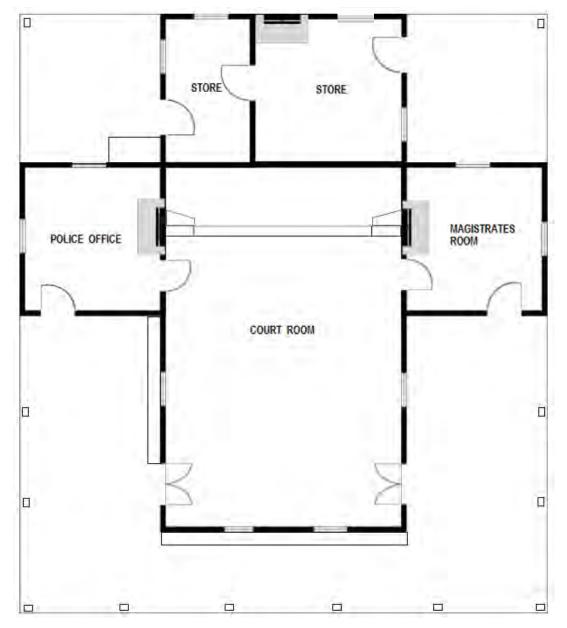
Interior plan of the Clarence Town Courthouse (Based on historic drawings of the Clarence Town Courthouse contained in Appendix F - NOT TO SCALE)
